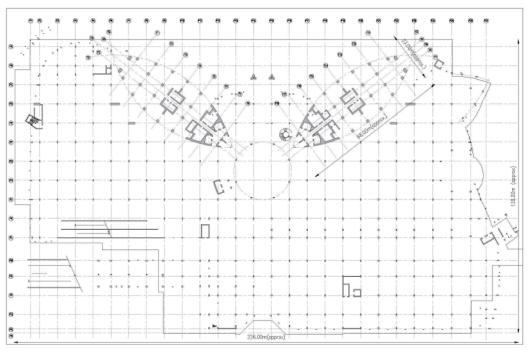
PLAN LAYOUT OF THE PODIUM AND TOWERS AT GROUND LEVEL
